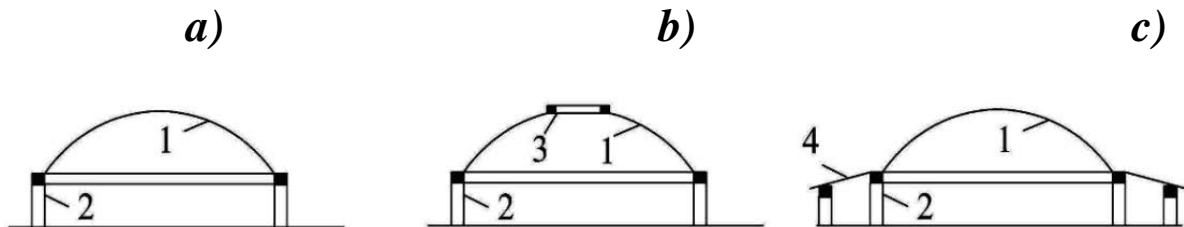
Structural schemes of thin-walled dome roofings:
